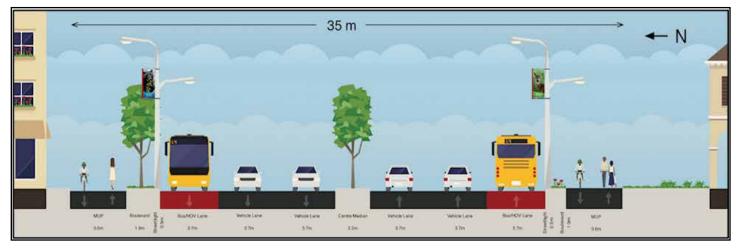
Lougheed Highway Typical Cross Section - Shaughnessy Street to Oxford Street
